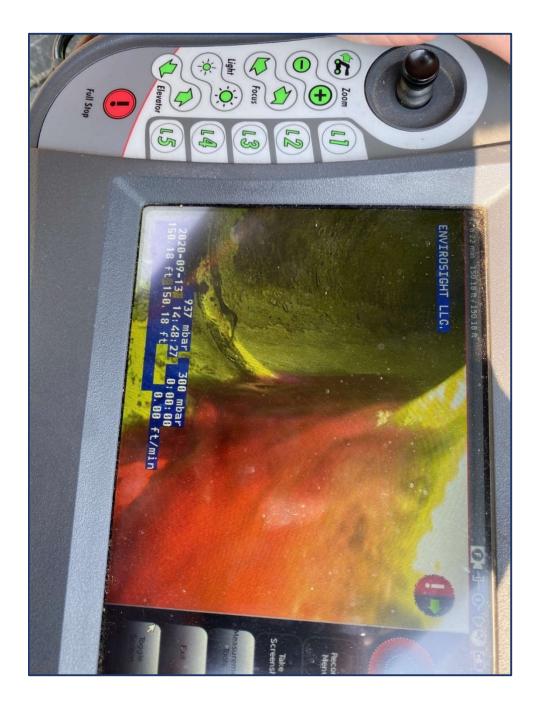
A. Illicit connection to storm drain at 150' south of manhole NV03-6W-1 located on the west side of Glenhill Drive. Green dye exiting the sewer lead to the storm drain from testing of the first floor bathroom of 1009 Glenhill Dr.
